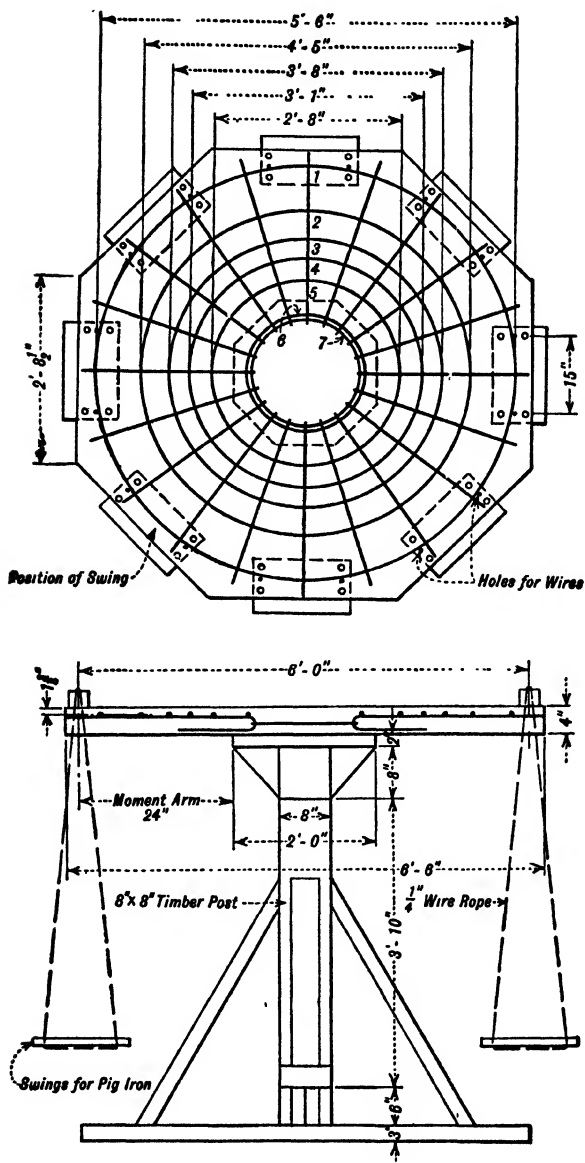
Cantilever Slab and Loading Platform. (See p. 116.)
